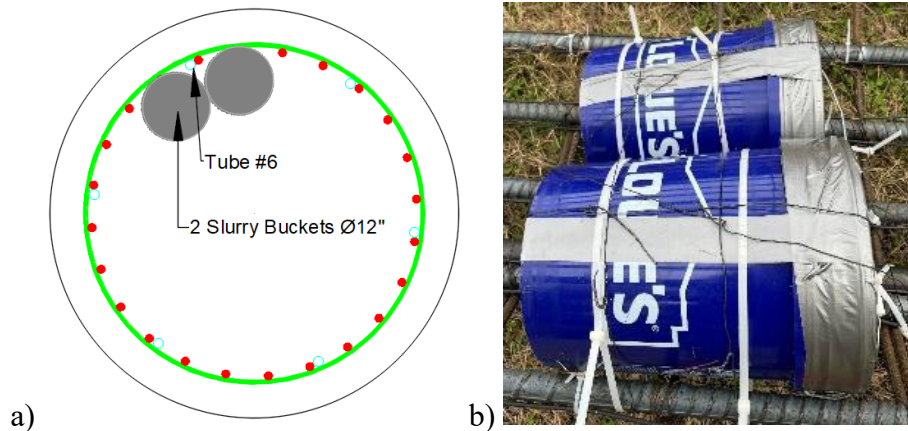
Slurry-inclusion defect simulation using buckets: (a) plan-view schematic of the Ø72-in. drilled shaft showing the placement of two Ø12-in. slurry buckets inside the reinforcement cage relative to the CSL tube layout, and (b) field photograph of the two buckets secured to the rebar cage prior to installation to represent entrapped slurry/low-quality concrete.
